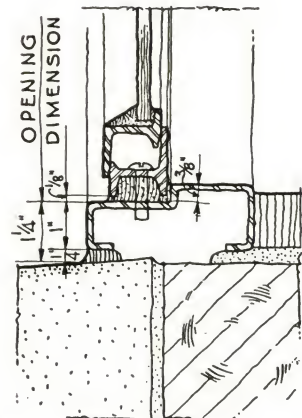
DETAILS SHOW ROLLED & PRESSED STEEL SUB-FRAMES IN CONNECTION WITH EQUAL LEG SASH FRAME SECTION
